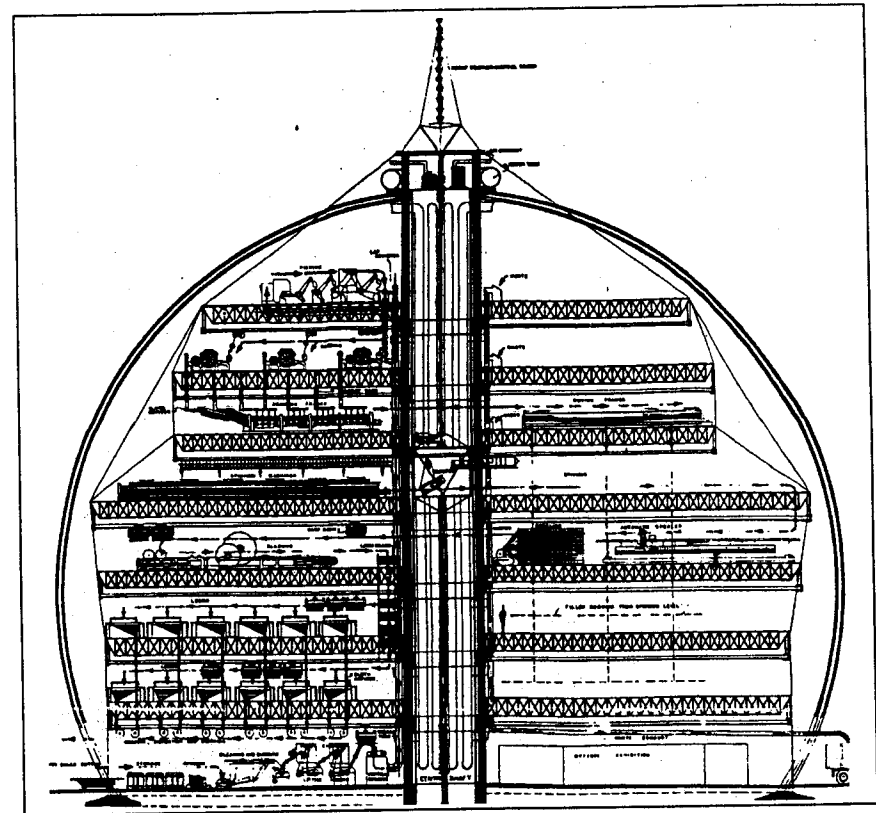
Buckminster Fuller's concept utilizing a rigid dome — section.
